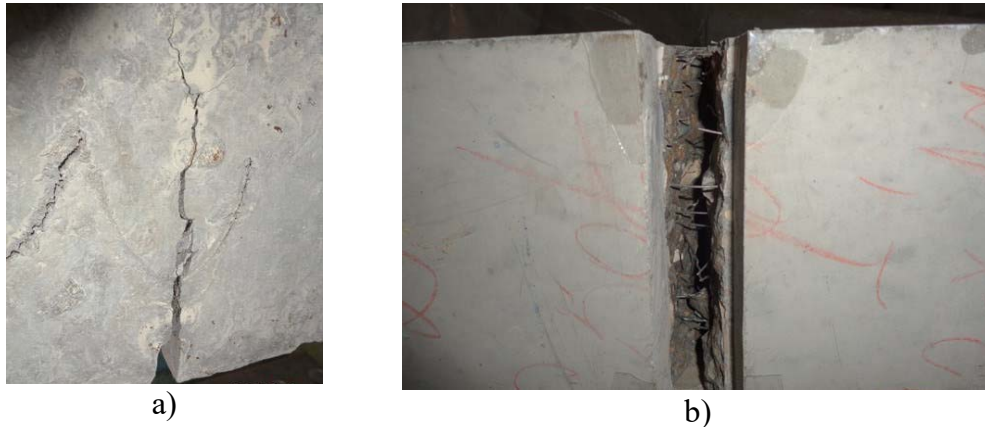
Failure mode of the specimen. Side view (a) and bottom view (b)
